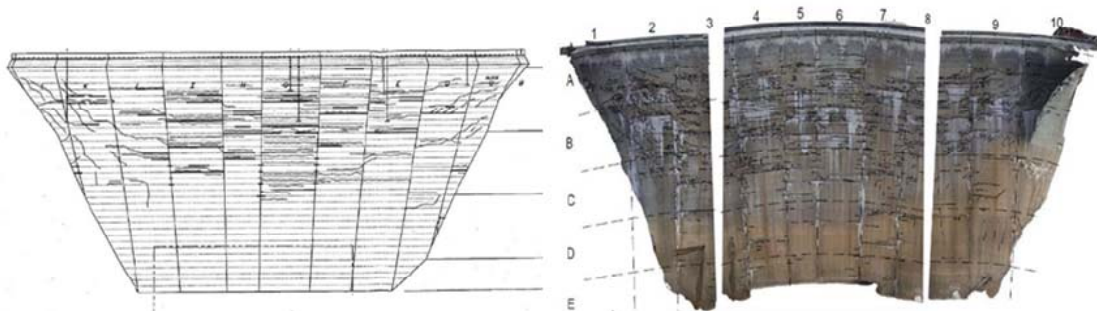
Downstream crack pattern observation (Salamon, Dressel, and Liechty, 2021)
